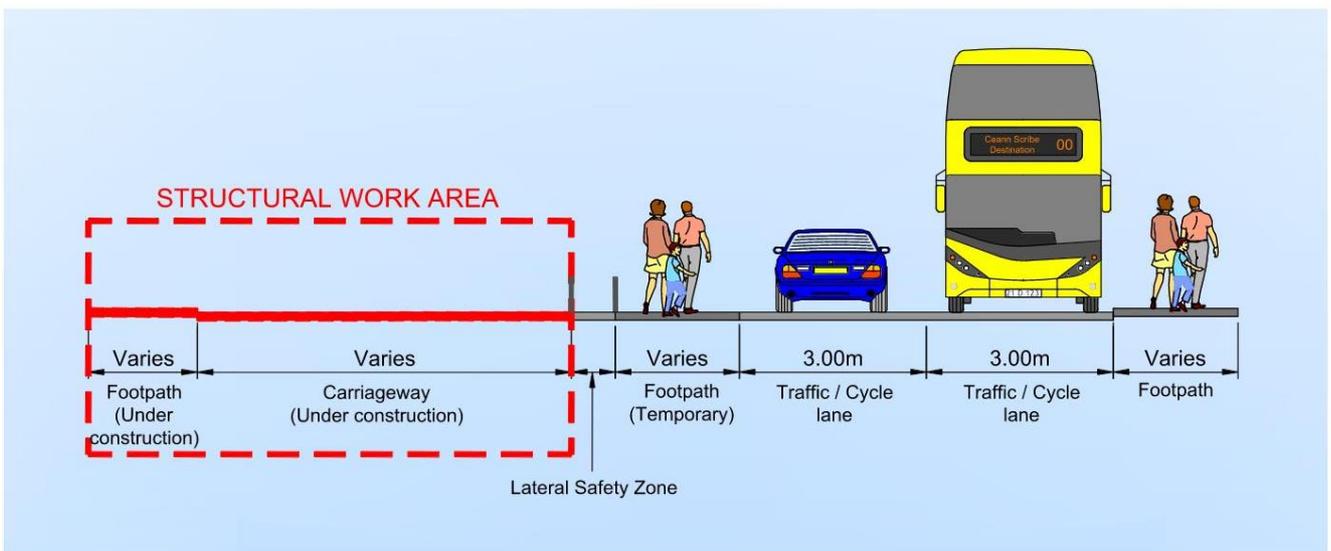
Traffic Management Cross Section, Section 3d, Royal Canal Bank Underpass – Stage 1
